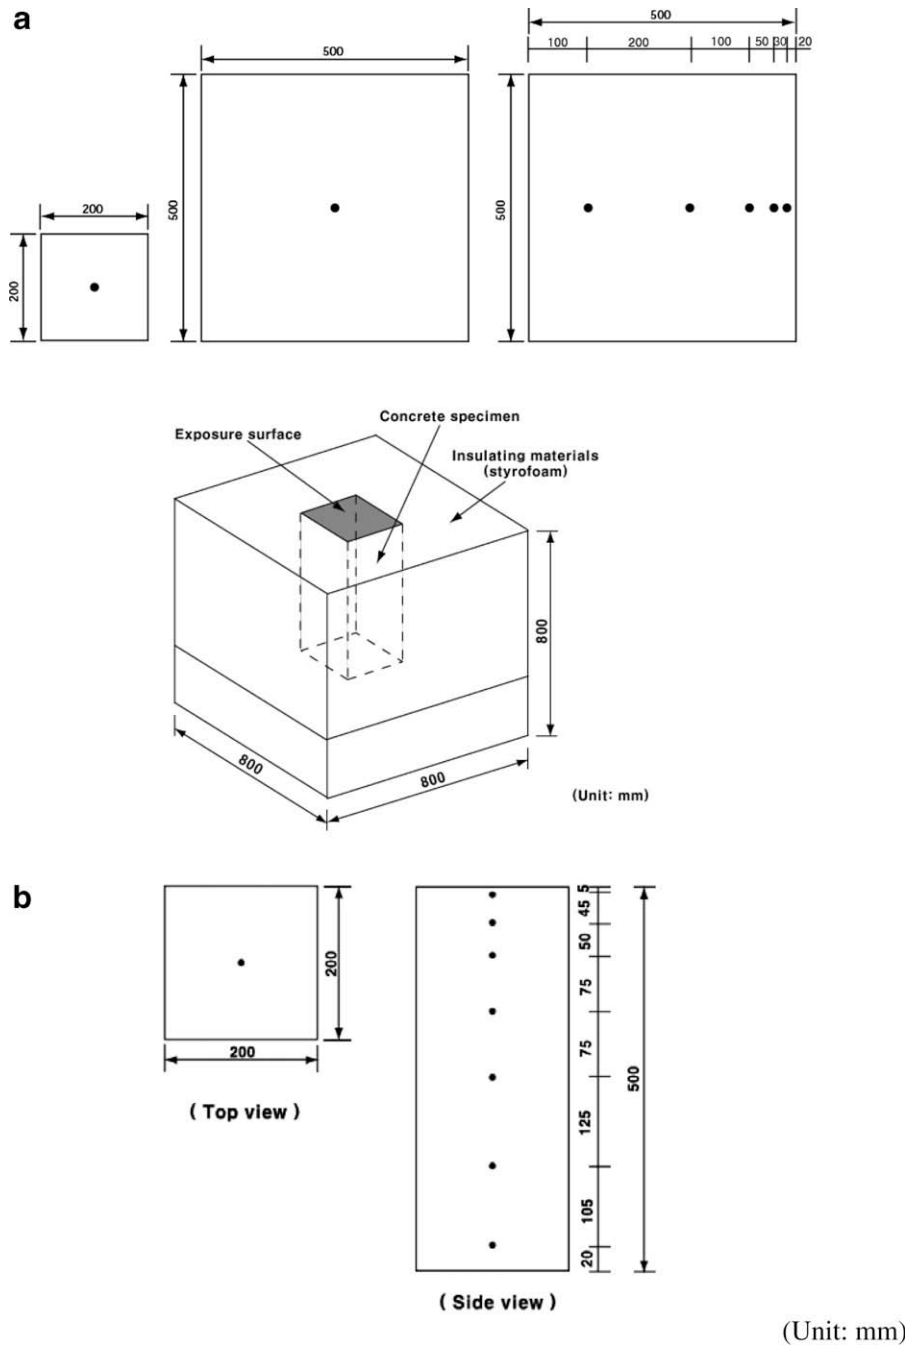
(a) Sizes and shape of specimens and insulating materials and (b) locations of thermo-couples.
